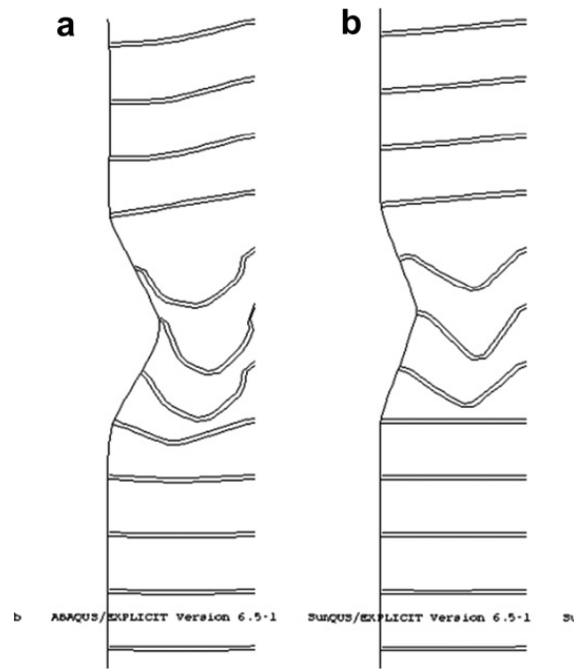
Deformed shape showing two collapse mechanisms, a) Weak floor mechanism, b) Strong floor Mechanism [11]
